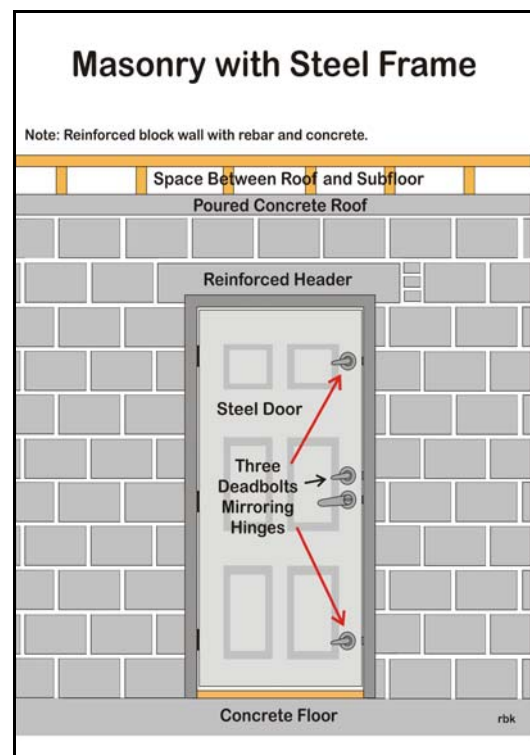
Masonry – For maximum protection, use poured concrete or concrete block filled with concrete with both horizontal and vertical steel reinforcing rods. Source: author – [file:\SH-DoorConstruction07.cdr].
